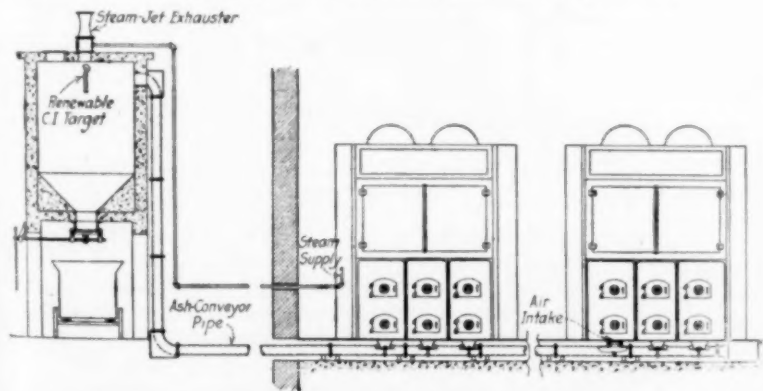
AIR CONVEYOR WITH VACUUM STORAGE TANK
